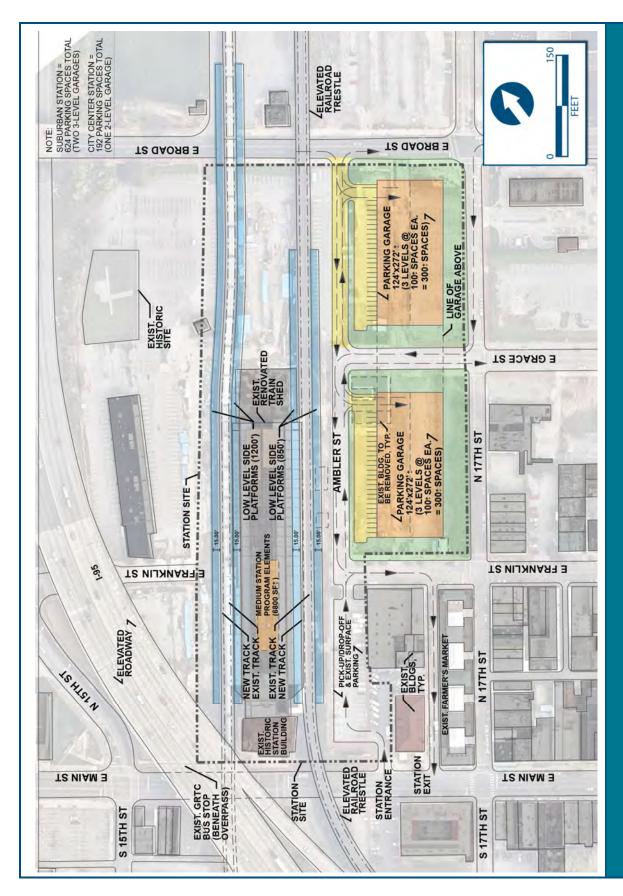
Main Street Station Improvements for Build Alternative 6D
